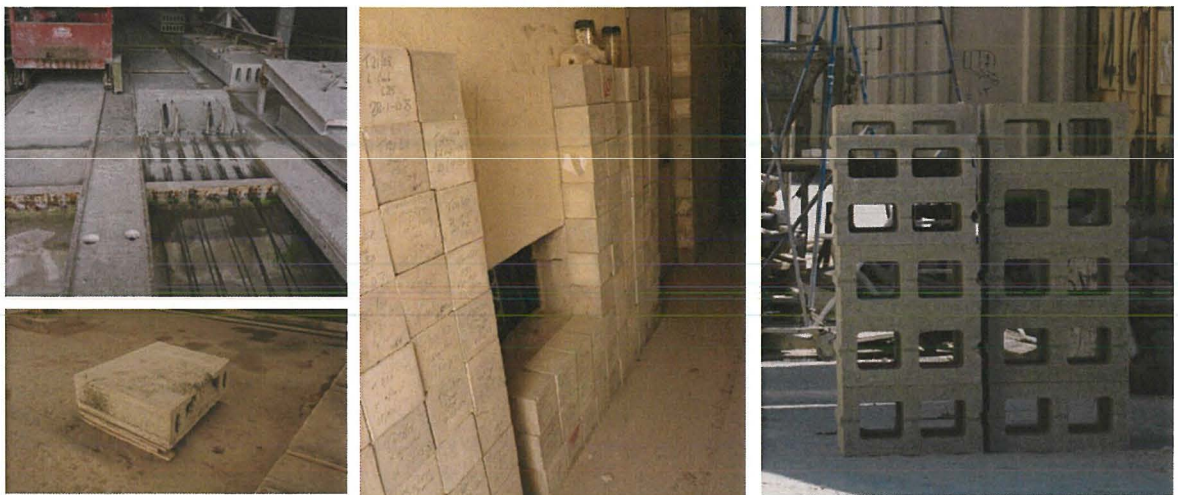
Cut-offs from precast elements, test cubes and block work
